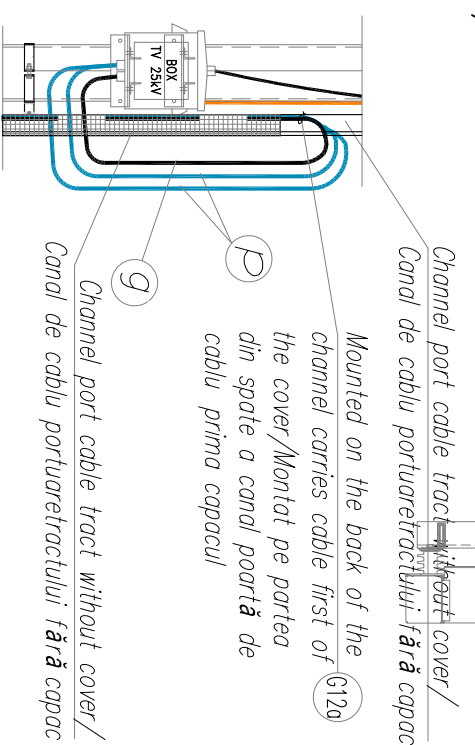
## DETAIL OF ASSEMBLY/DETALII DE MONTAJ
